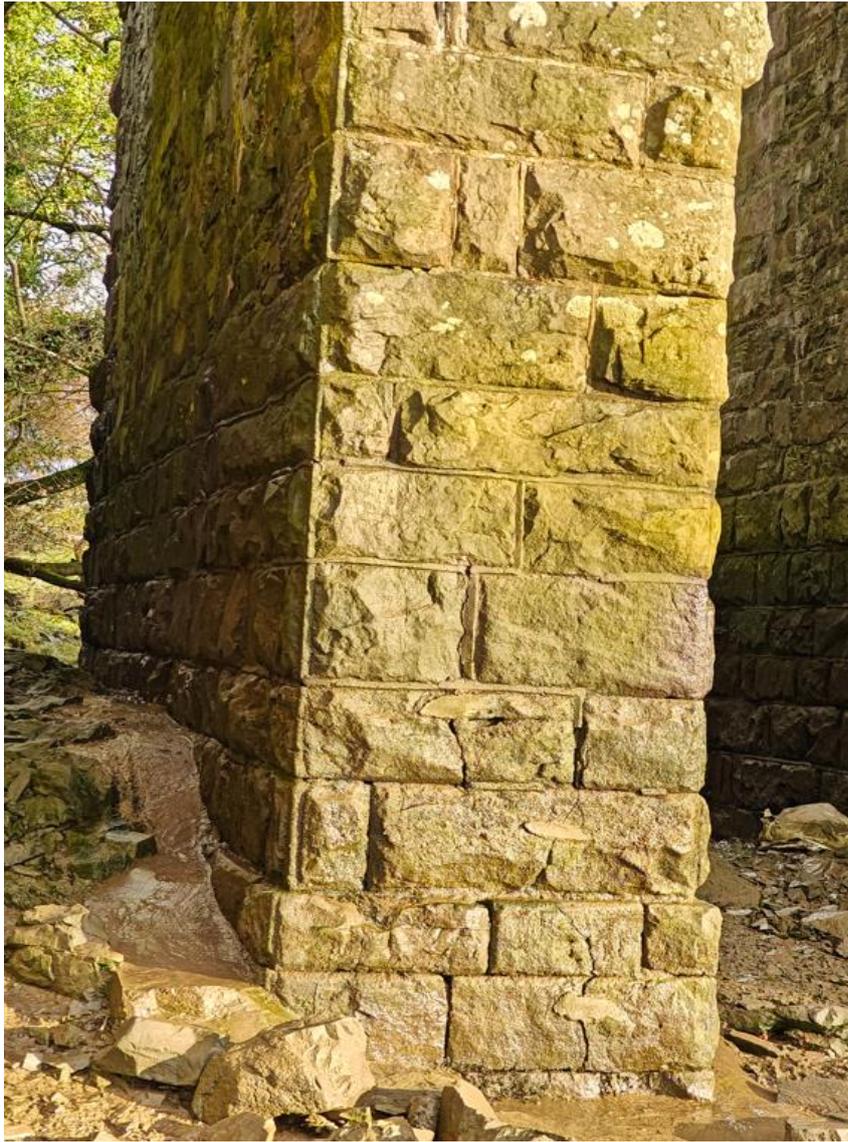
Elevation showing coursework of existing (North) Intermediate pier at shorter face
